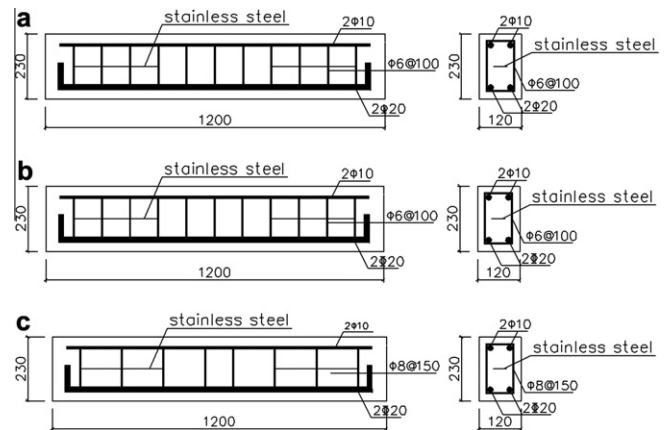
Details of the beam specimen (units: mm). (a) Type A; (b) Type B and (c) Type C.
